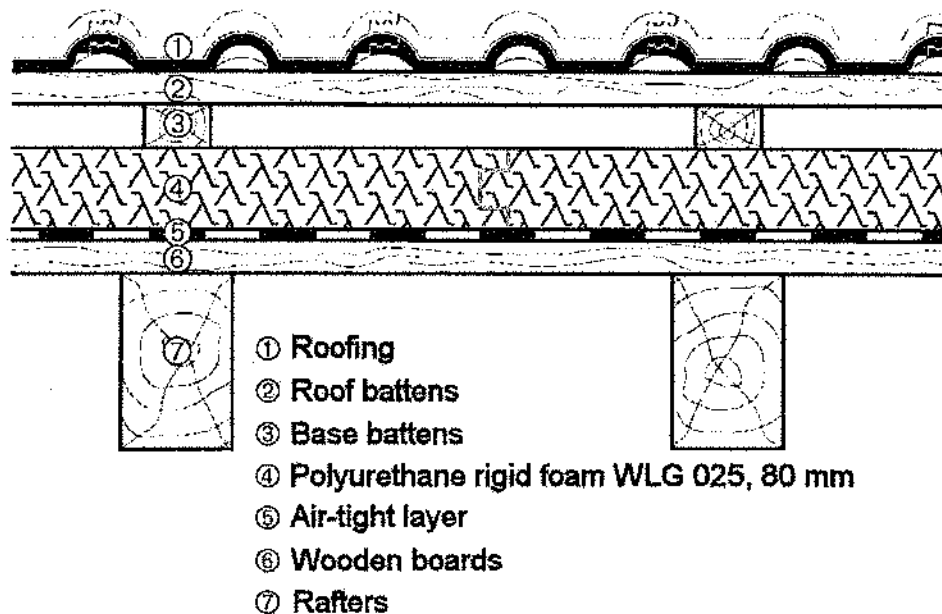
Polyurethane pitched roof insulation with air-tight layer on visible timber cladding
